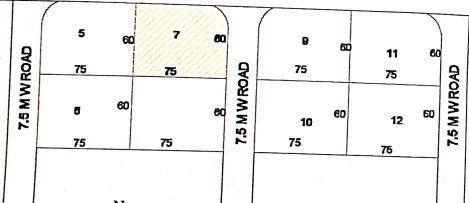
DETAILS OF SUBDIVIDED PLOT AREA STATEMENT
